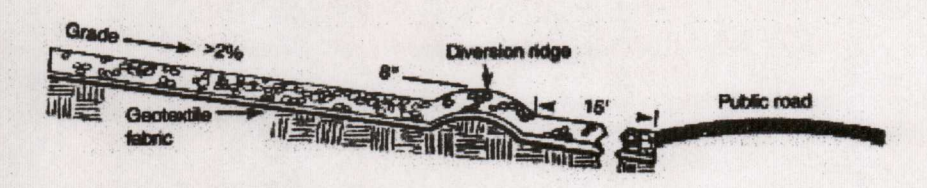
Cross-section of a Construction Entrance/Exit (NC, 1993)
